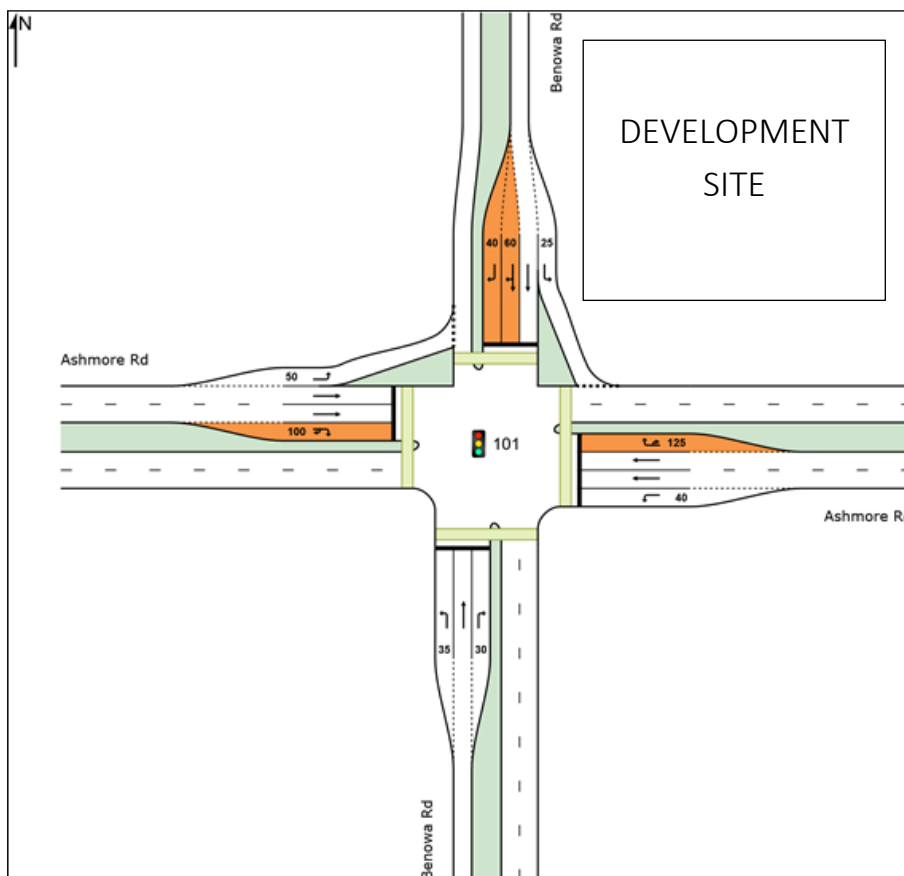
Ashmore Road / Benowa Road Intersection (Upgraded Configuration) – SIDRA Layout
